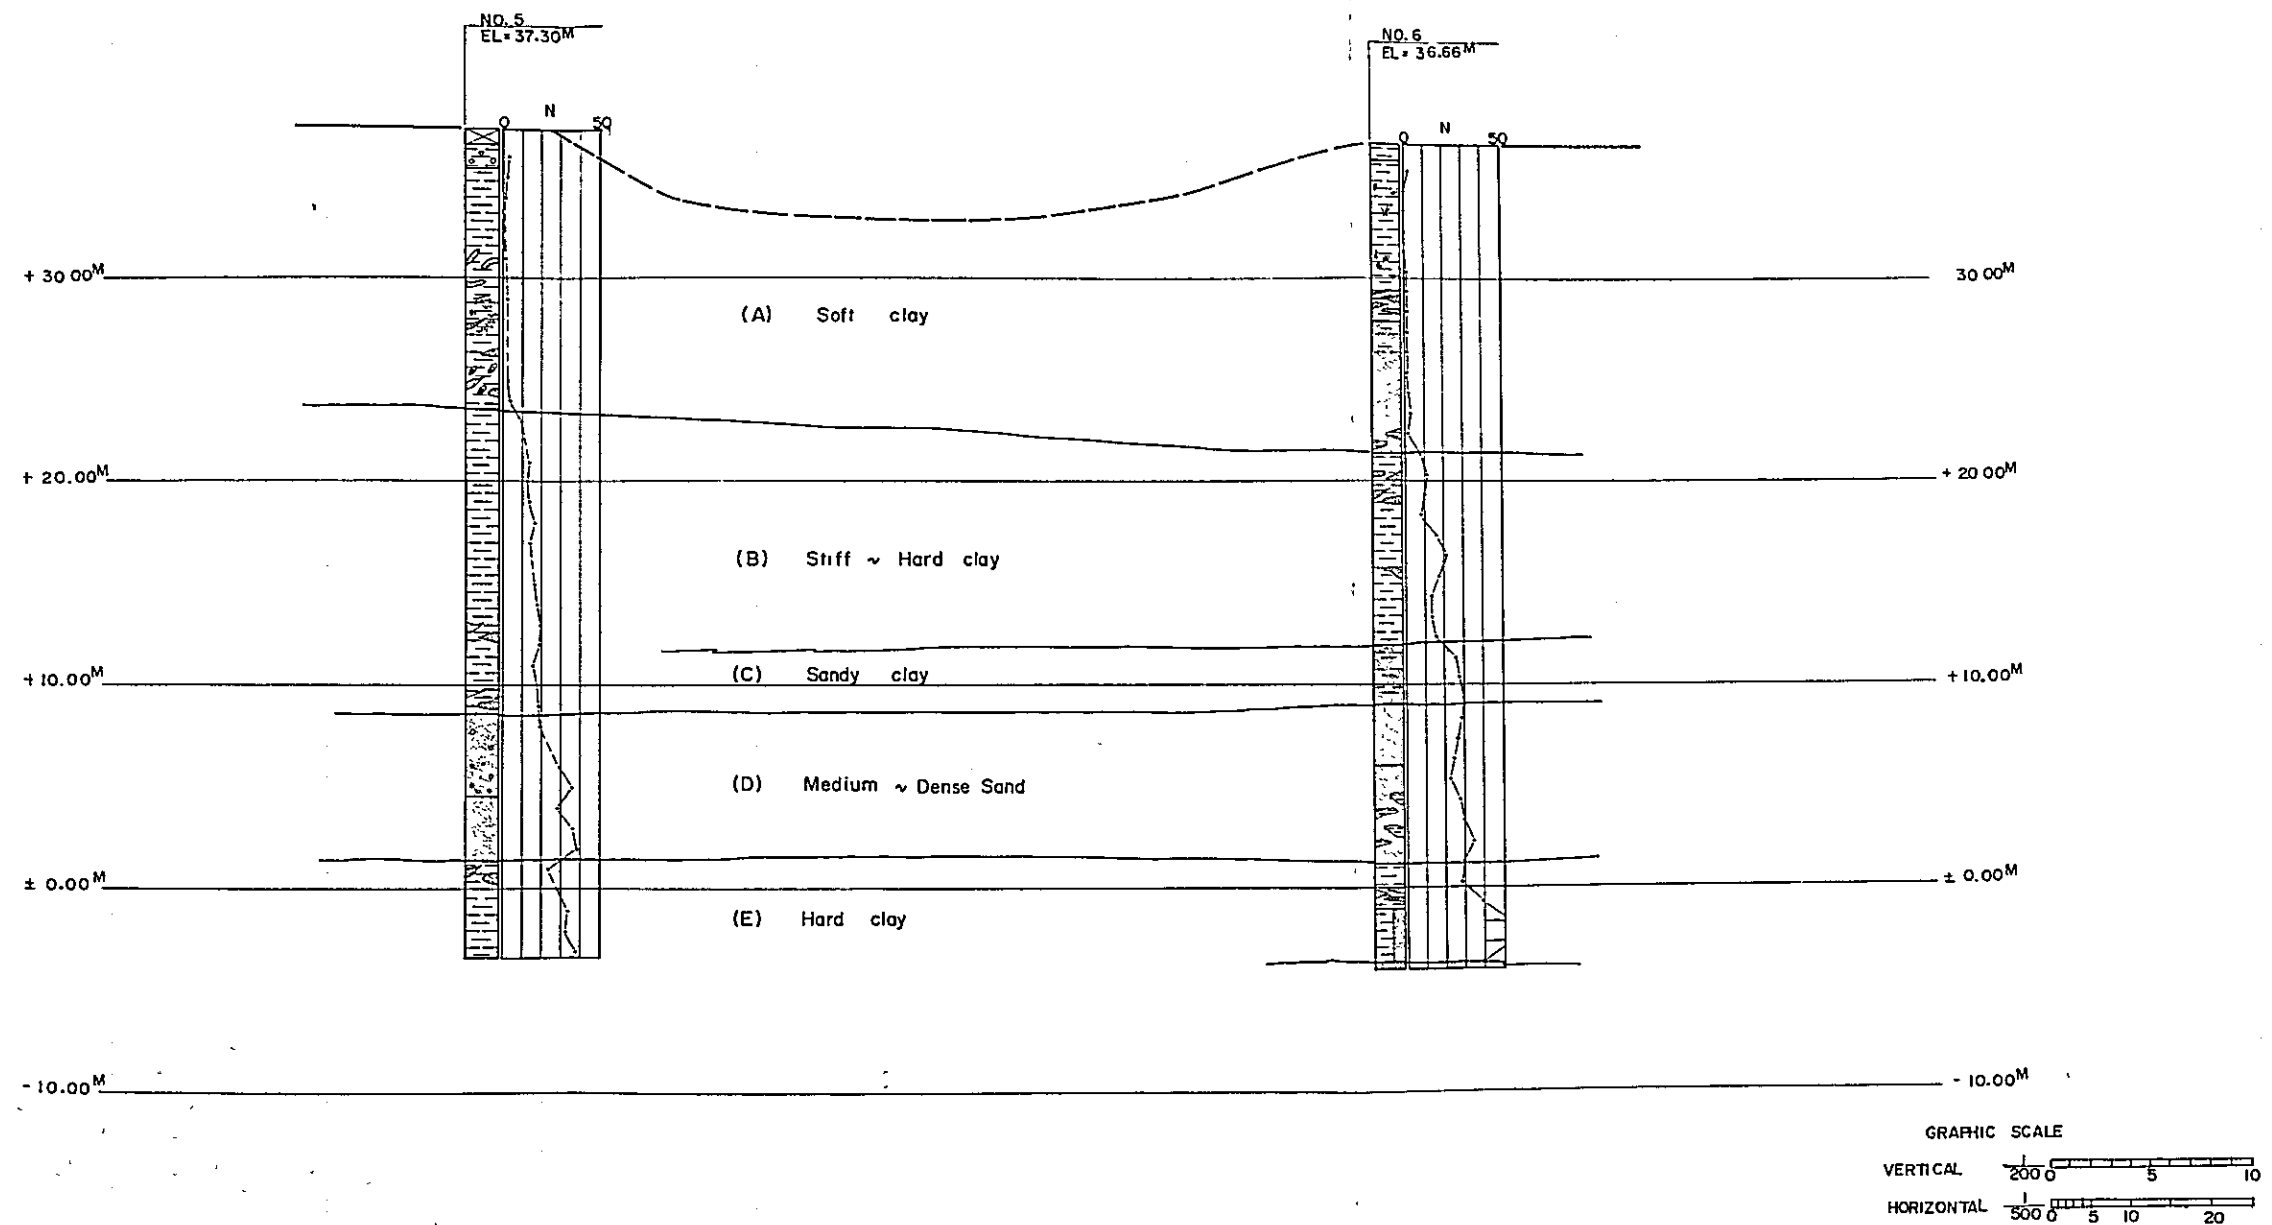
SOIL PROFILE OF BANGKOK-NOI BRIDGE
